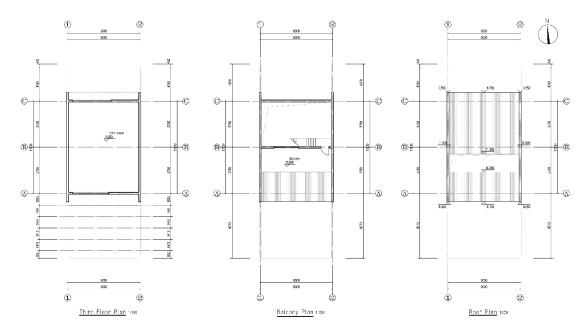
The Third Floor Plan, Balcony Plan and Roof Plan of Building (Drawn by the author)
